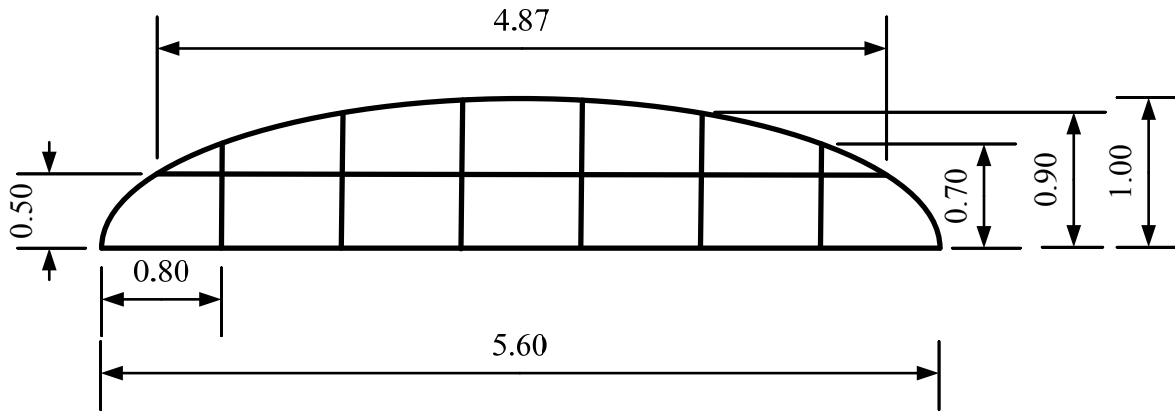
B2. Profiles of roof sides for the Boral kiln.
